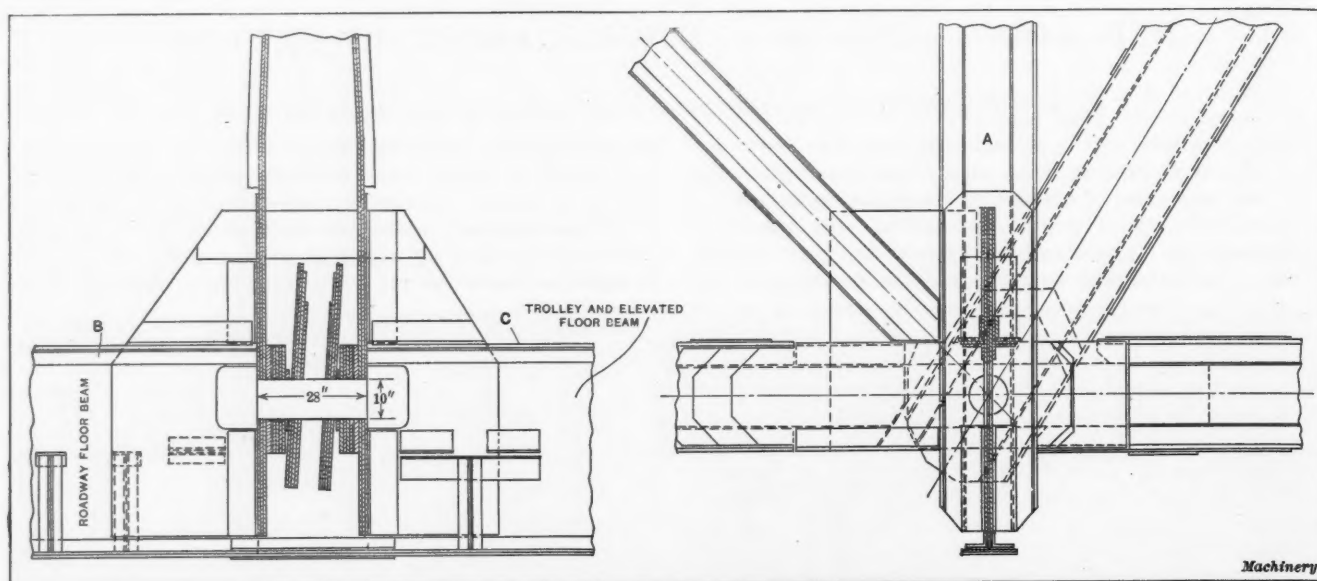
Section and Elevation showing Pin Connection between Approach and Main Span Trusses
